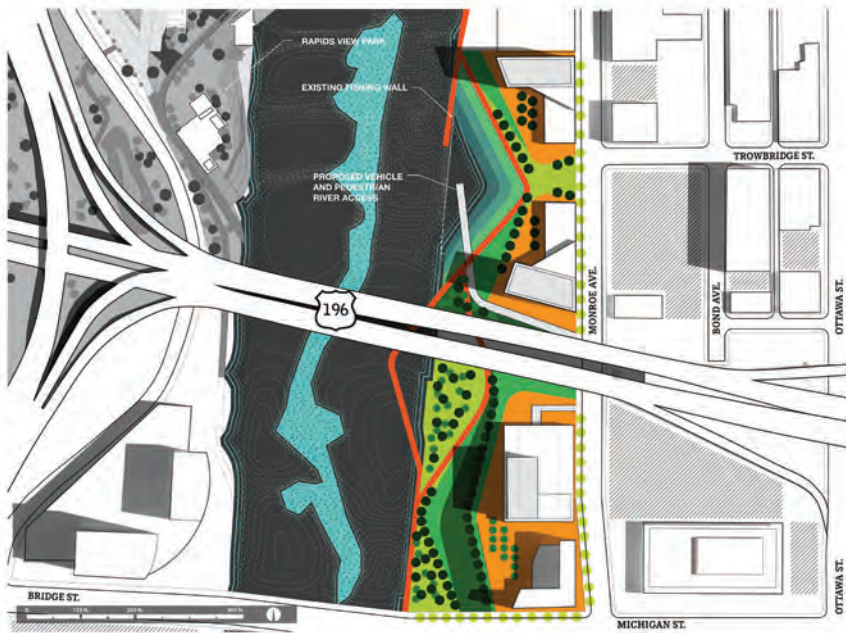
Proposed MSU / City / KC site plan - Alternate 1
